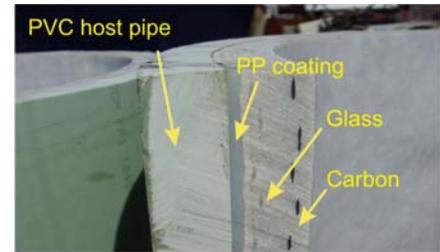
Cross-section of a composite CIP liner installed in a PVC host pipe (Shearer, 2007)
